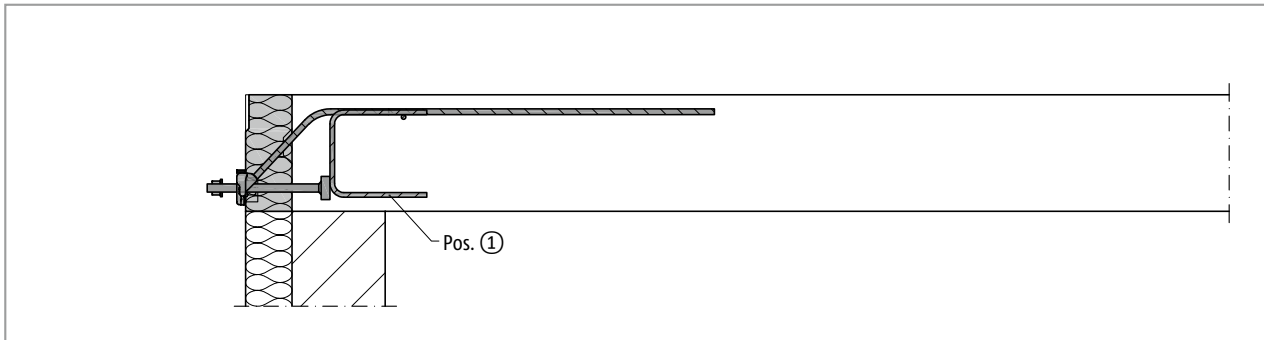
Schöck Isokorb® T type SQ: On-site reinforcement: Cross section
